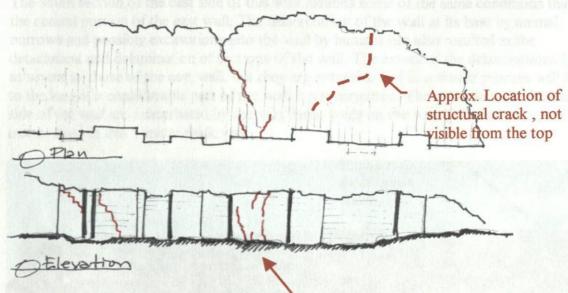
Sketch plan and elevation of the north end of the east low wall. The sketch is not drawn to scale, but the exact relationships of the pilasters, the cracks and the crack on the top of the wall is accurate.
